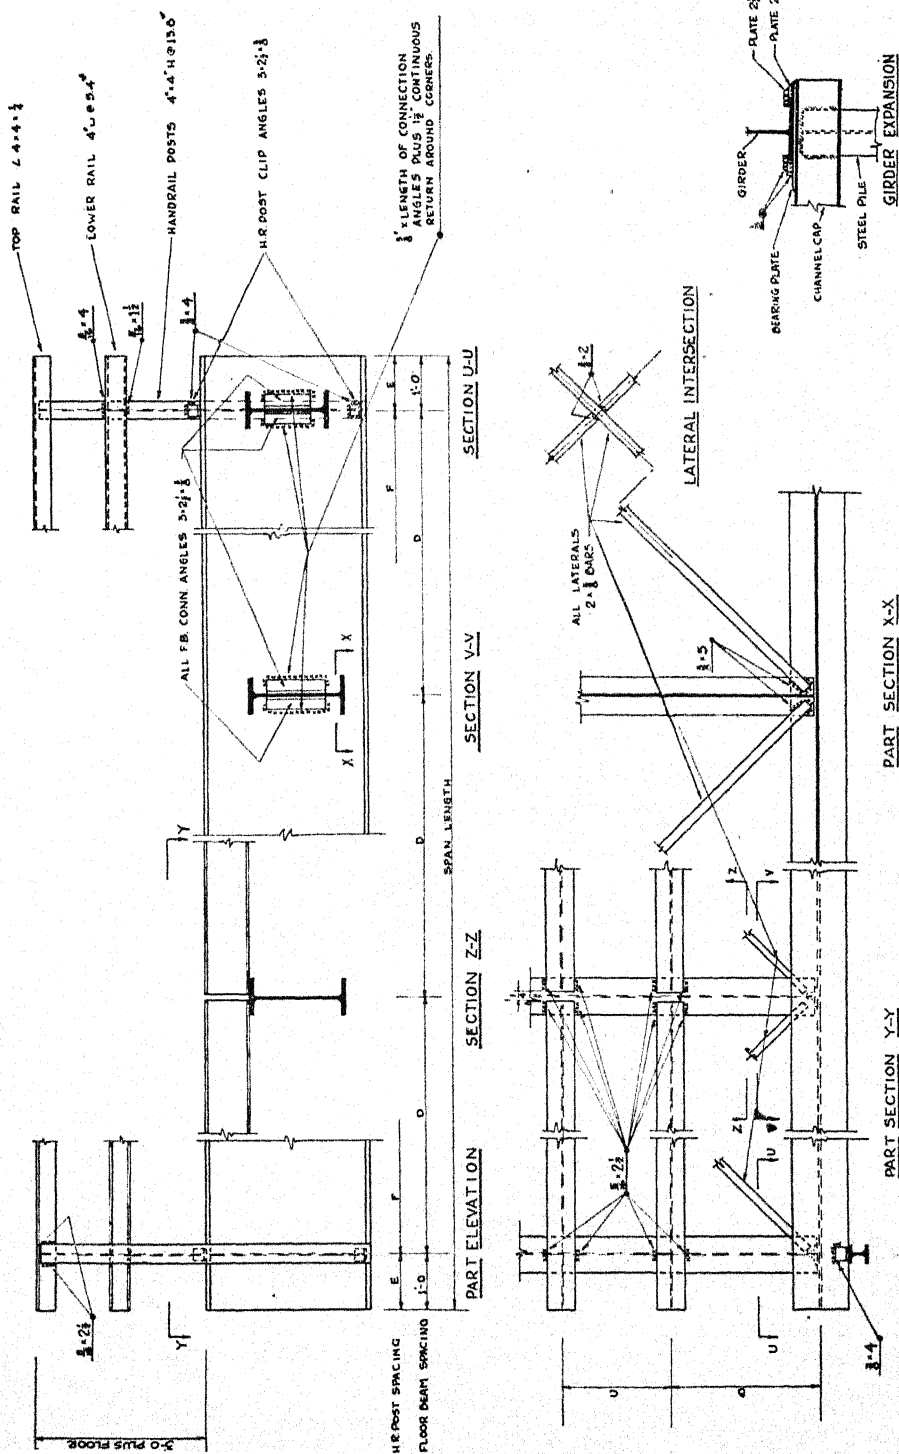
Design of superstructure and steel rolling for arc welded three-panel deck steel girders. See also page 607a.
